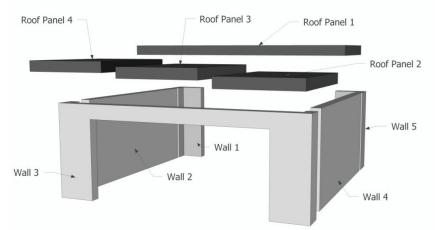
Exploded view of Trial 1 showing locations of wall and roof panels
